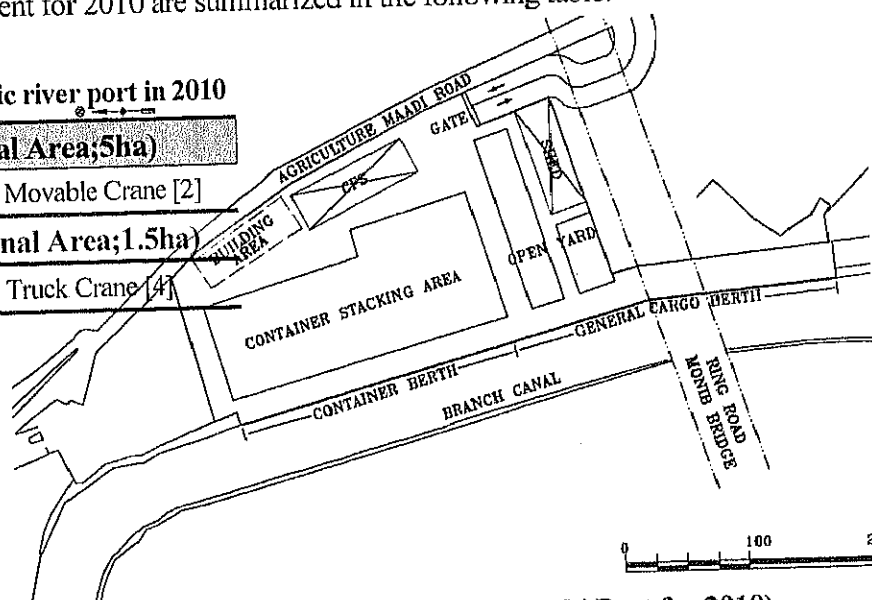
Layout Plan of Ather El Nabi Port for 2010)
